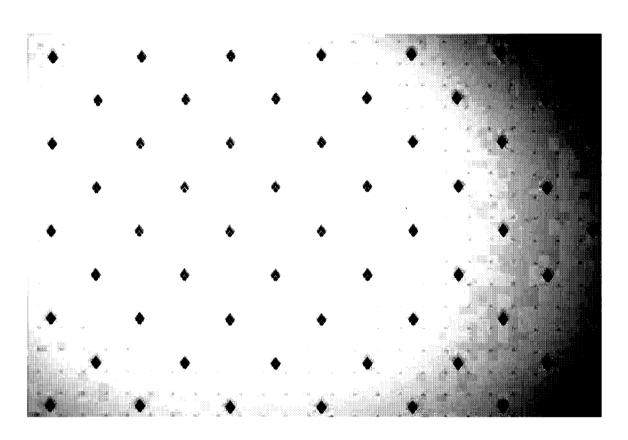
Arrow pattern vinyl wall covering, NE office of Sales/Marketing area
